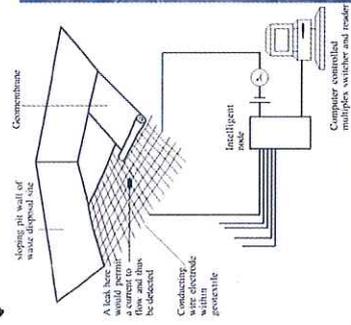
Application of ELDEG geotextiles to waste disposal pit prior to use
